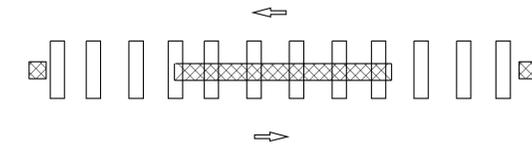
WITH CENTERLINE RUMBLE STRIP
